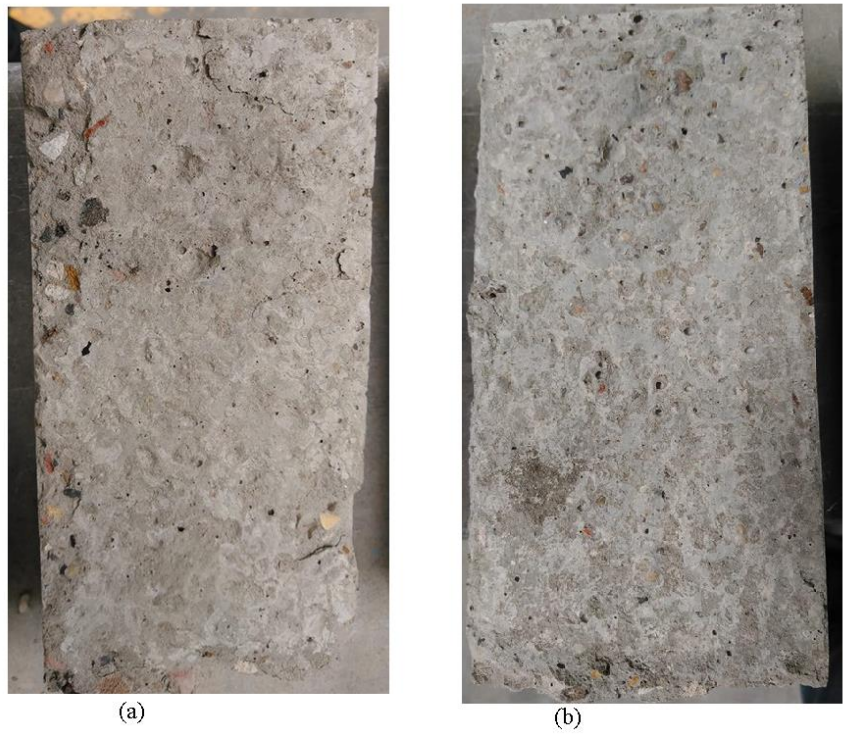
Failure modes of specimens (a) Interfacial failure with partial failure of the substrate (recycled concrete) (b) pure shear failure.
